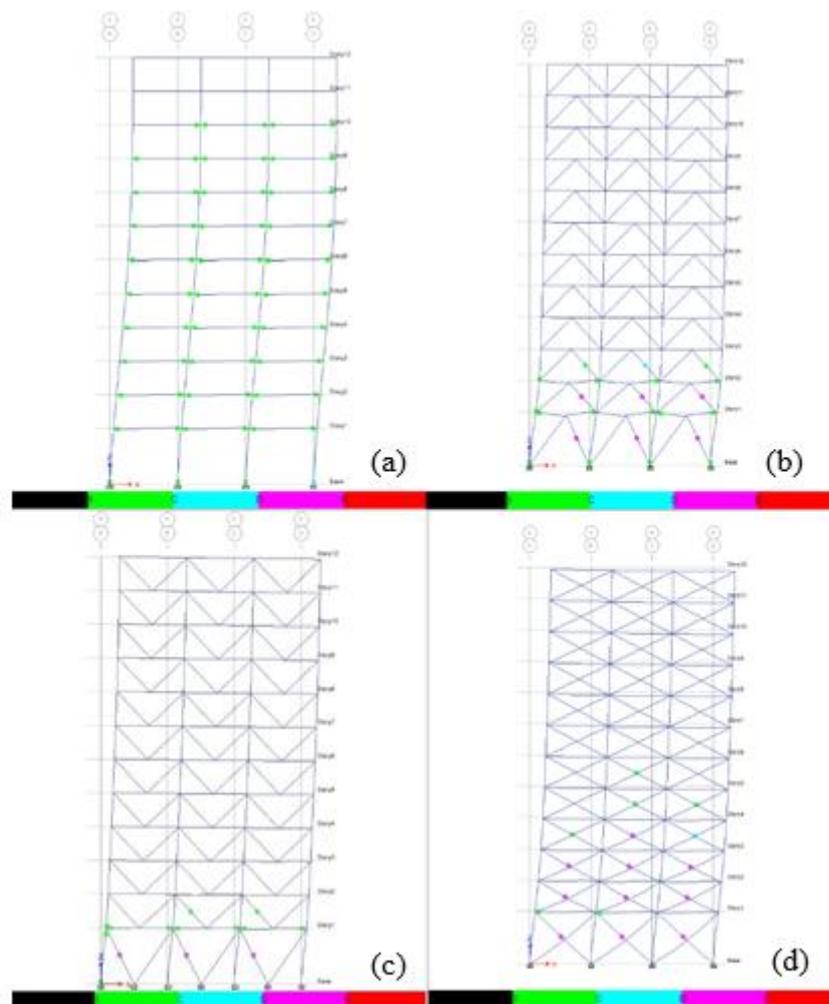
Plastic hinge formation in 12 storey frame with and without bracings
